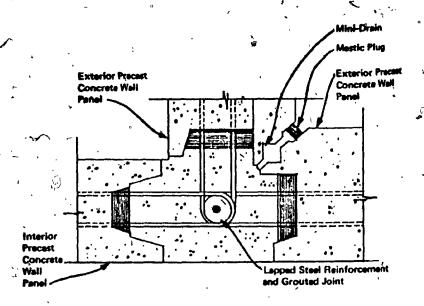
B.S.I.; Mini-Drain at:Vertical* Wall Panel Joint (Ref. 32)
